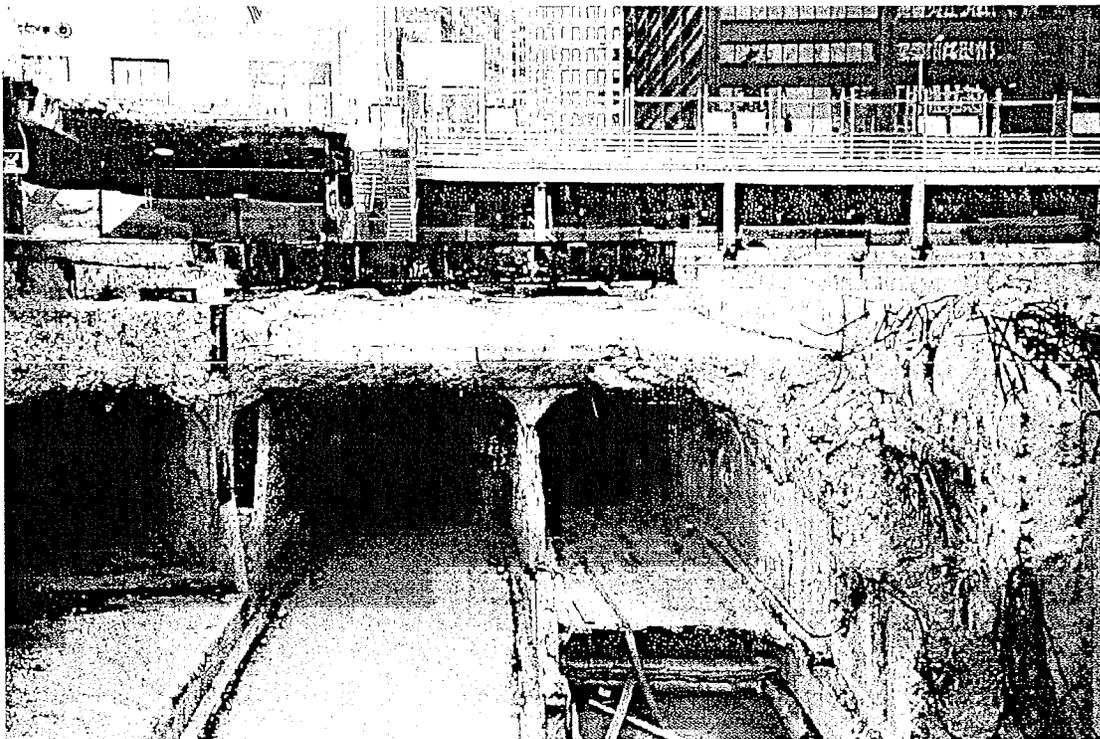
Excavated "bathtub" area west of Greenwich Street, looking southwest. Covered I.R.T. subway along Greenwich Street in foreground. West Street in background.
